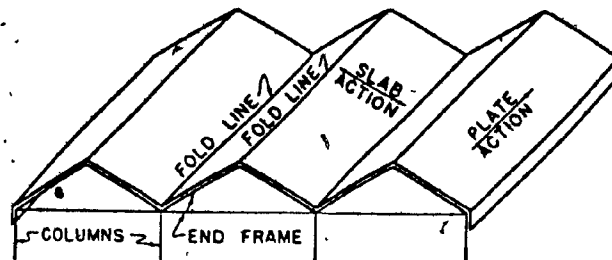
SLAB BEAM ACTION (REF. 24)
